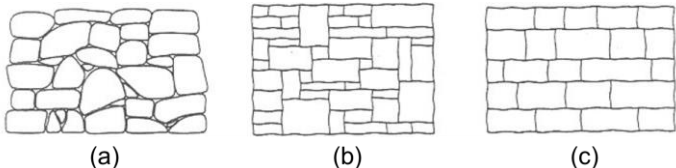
Classification of stone masonry: (a) rubble masonry, (b) ashlar masonry and (c) coursed ashlar masonry (Lourenço, 1998).
